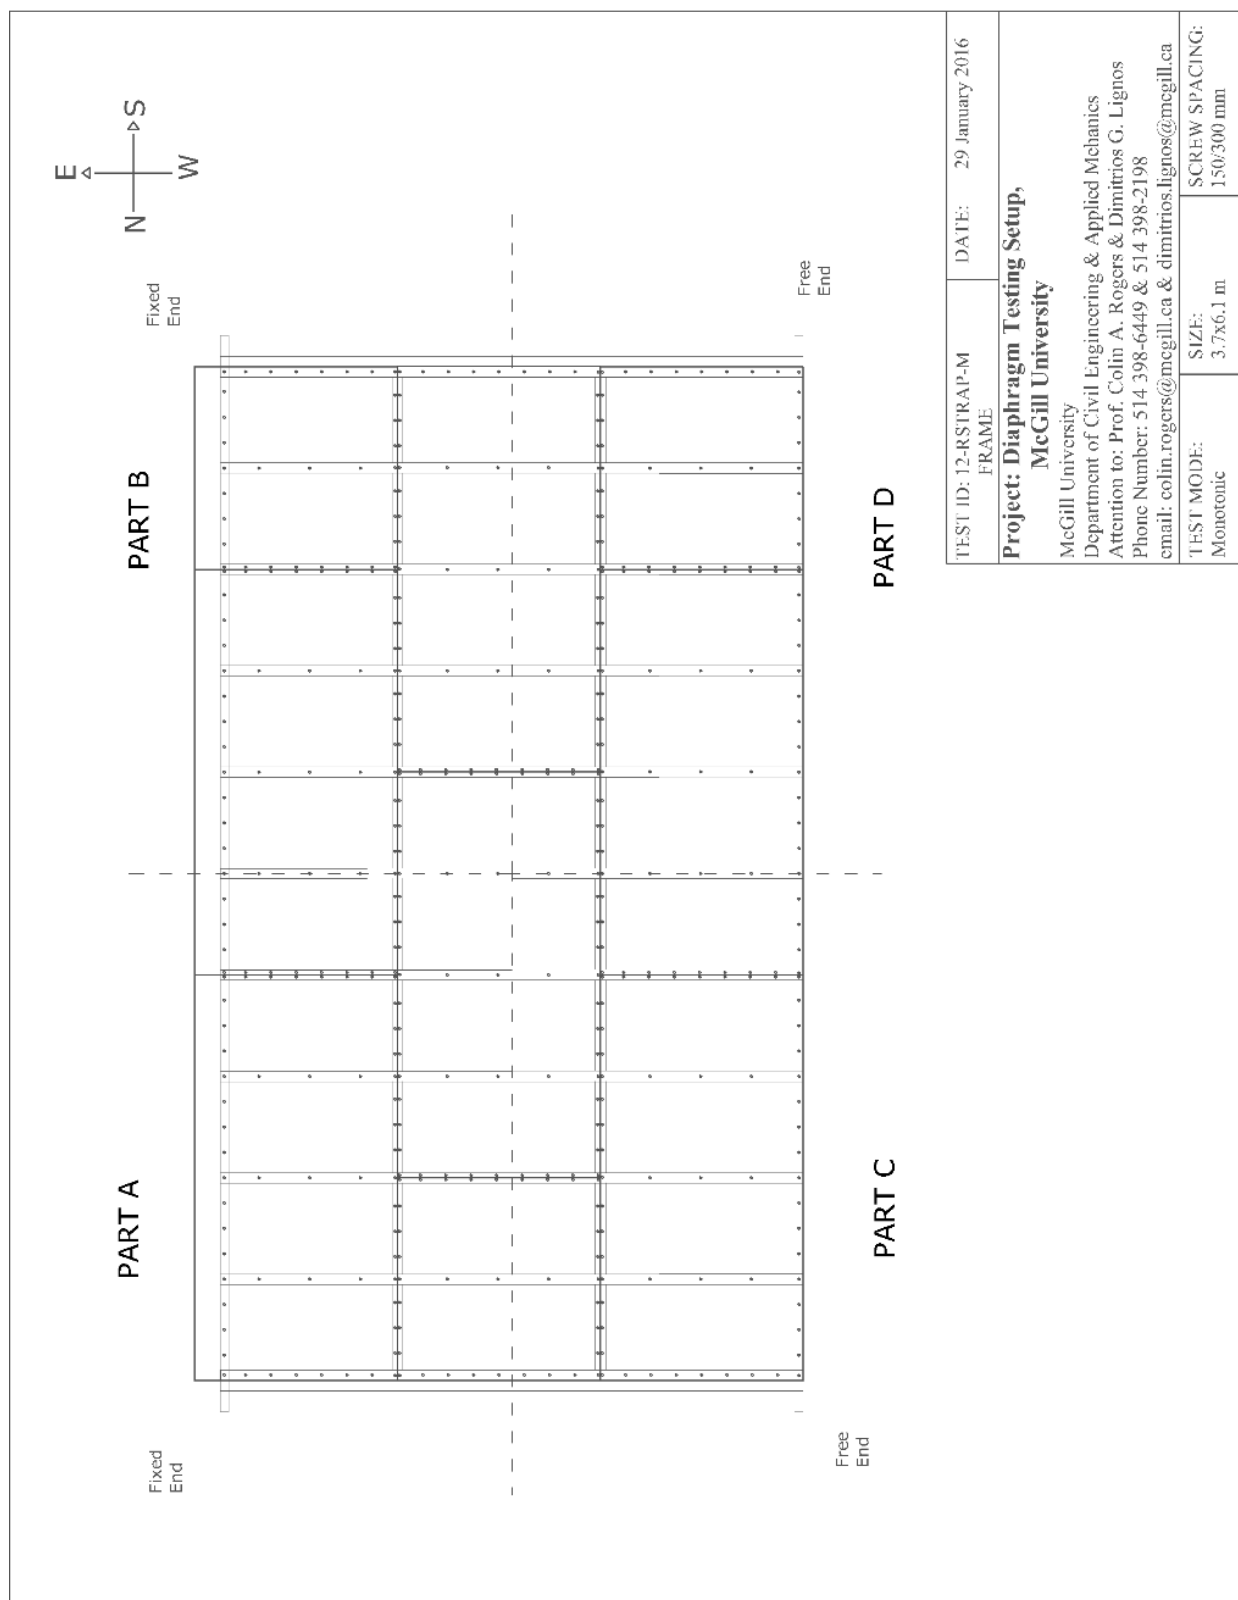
Sheathing Fastener Placement for Specimen 12-RSTRAP-M
